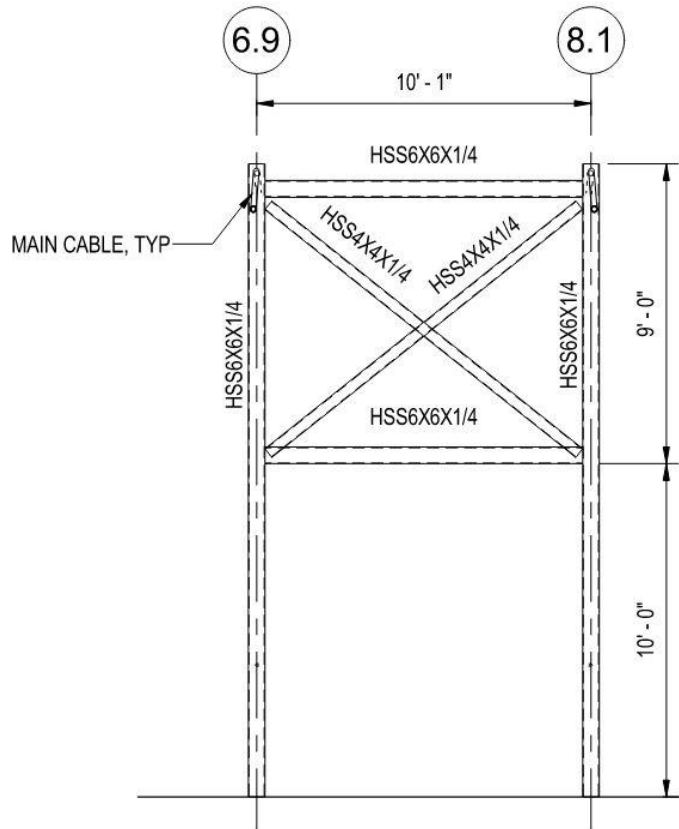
SECTION AT SUSPENSION BRIDGE TOWERS
